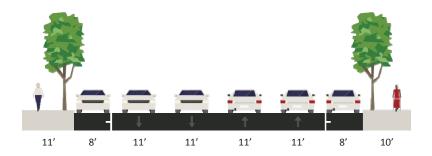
Twiggs Street Typical Cross-Section, between Marion Street and Florida Avenue
